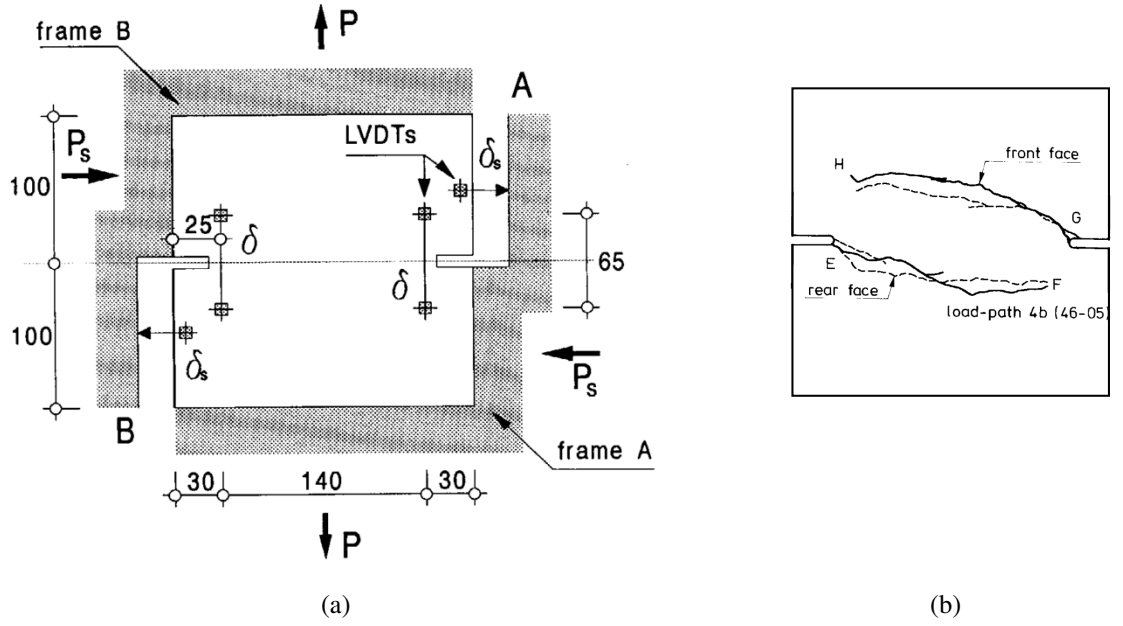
Shear test of a double-edge notched (DEN) concrete beam (Nooru-Mohamed, 1992): (a) specimen geometry and loading set-up and (b) fracture patterns.
